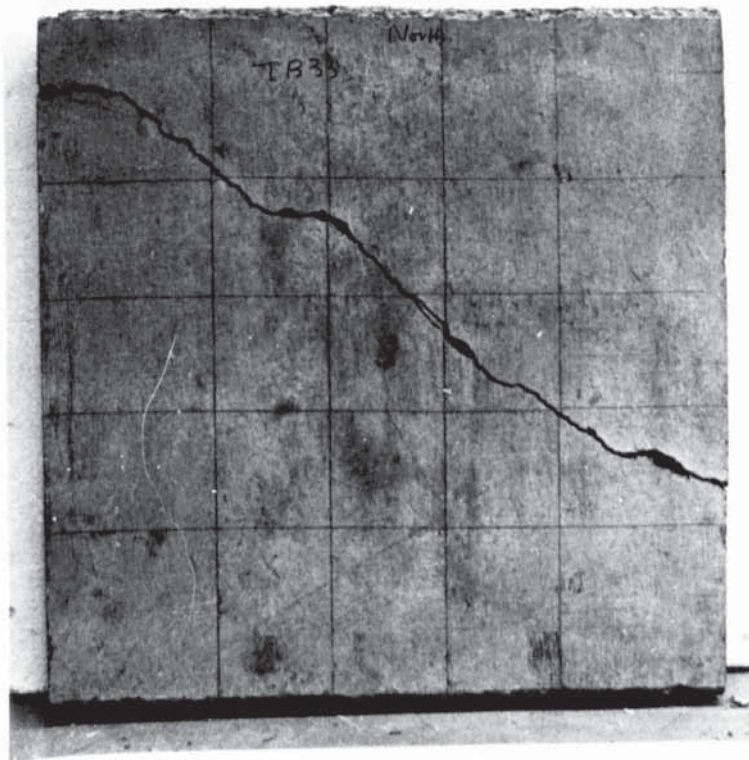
SINGLE CRACK FAILURE (SPECIMEN TB 33)
